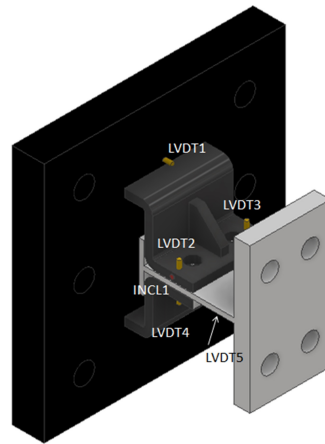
Instrumentation arrangement A-RP specimen: T-plug (thickness 6 mm) and reverse channel (10 mm) in bending, with stiffeners.
